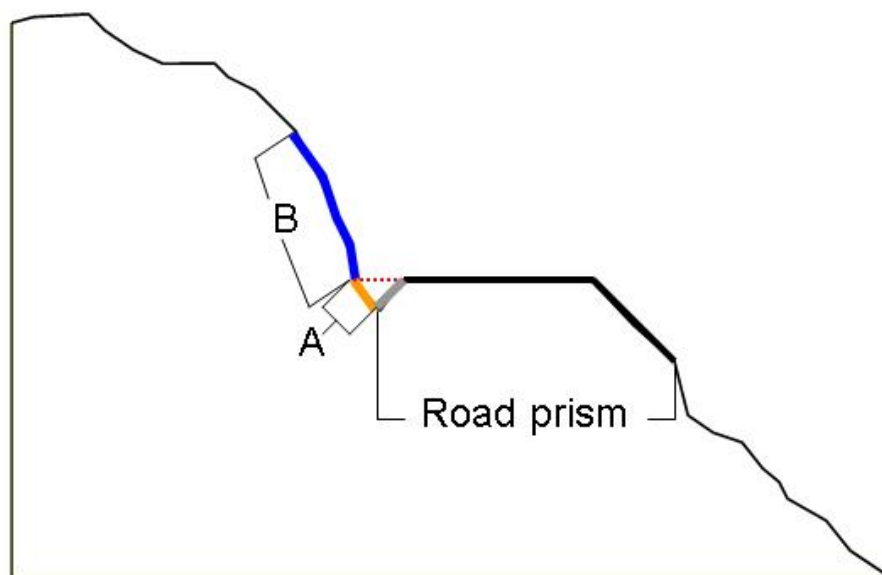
depicts a cross section view of a cut slope wetland adjacent to a road. Section A represents a ditch adjacent to the road prism, and Section B represents the cut slope wetland. WSDOT obtains federal, state, and local permits and also provides compensatory mitigation prior to conducting any ground-disturbing activities in cut slope wetlands (Section B).
